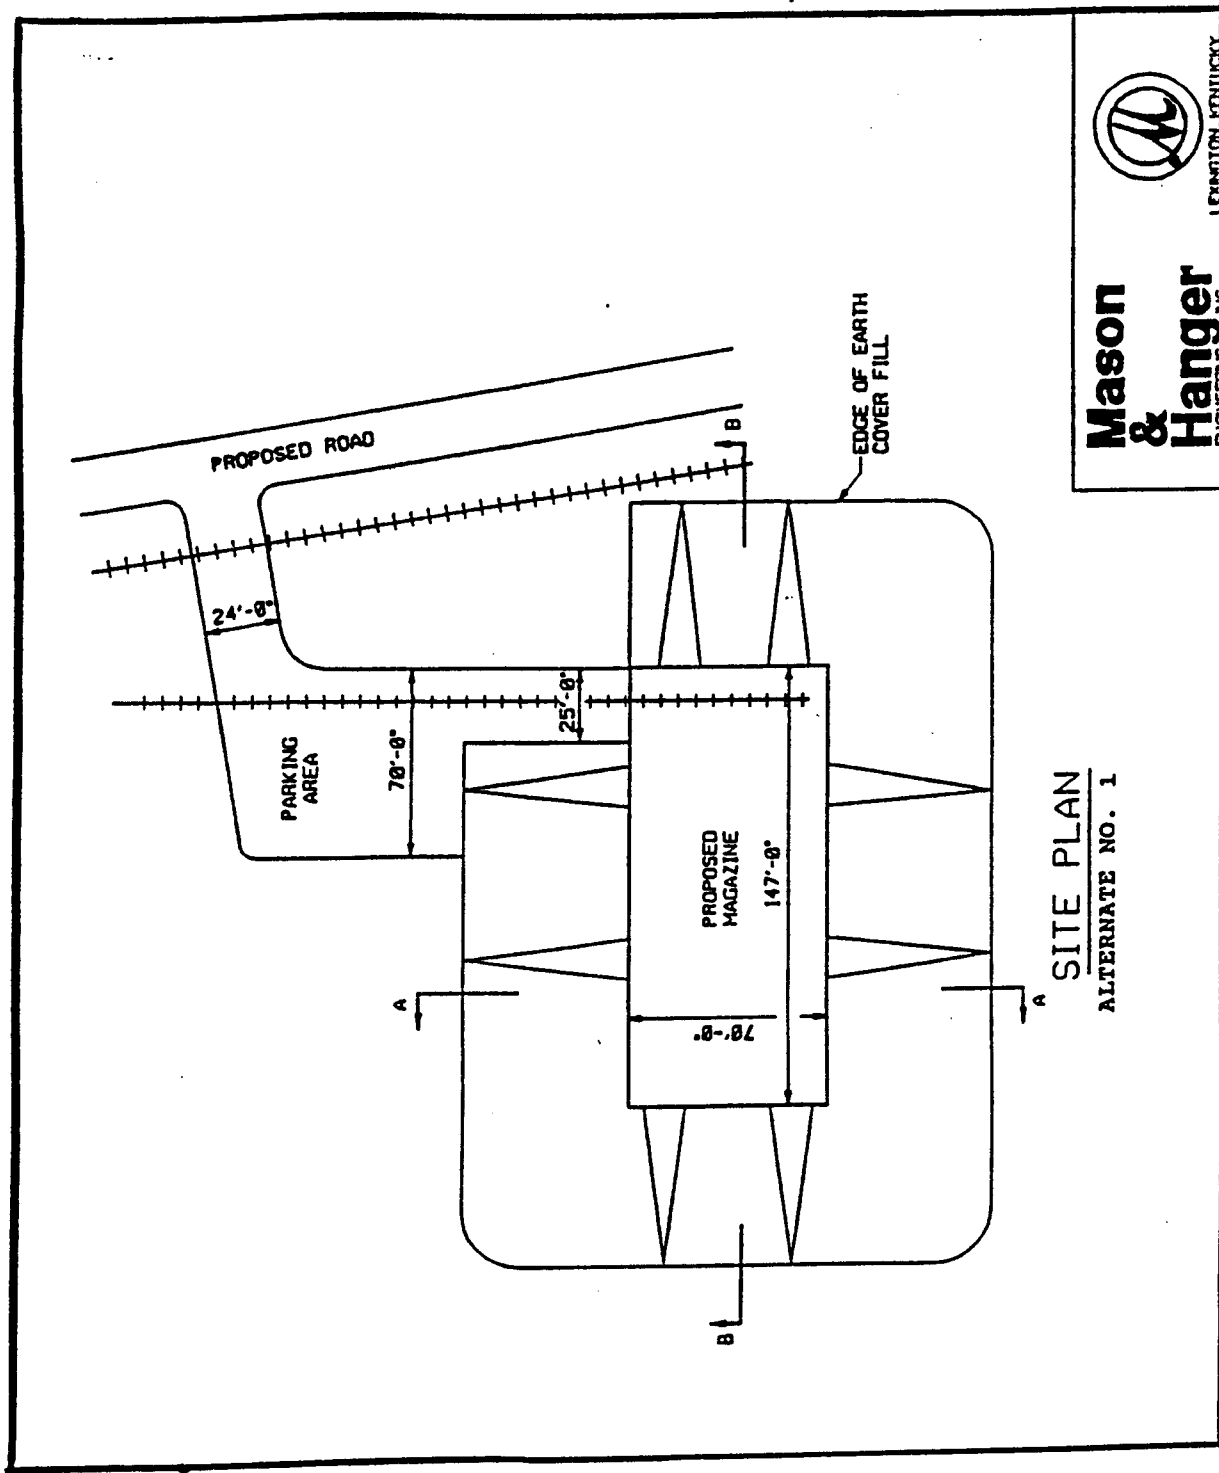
General site plan for STANDARD Missile Magazine, MILCON P-137 (Ref 1).
